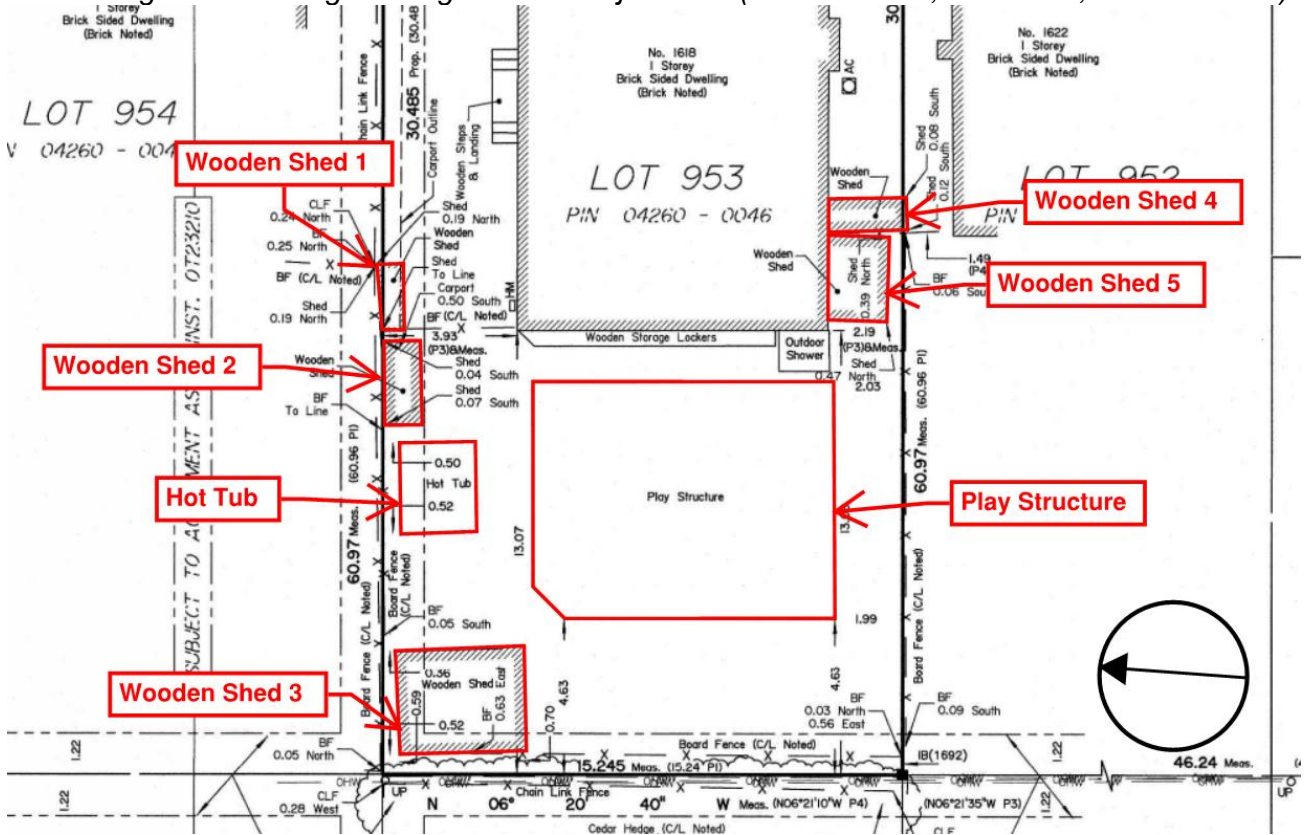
Site Plan. (Source: Annis, O'Sullivan, Vollebakk Ltd.).
